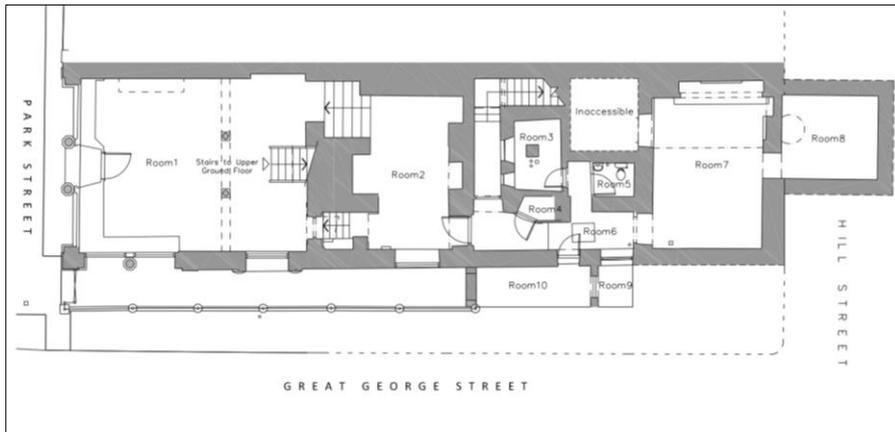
As existing Lower Ground Floor Plan Source W H Architects Limited.
